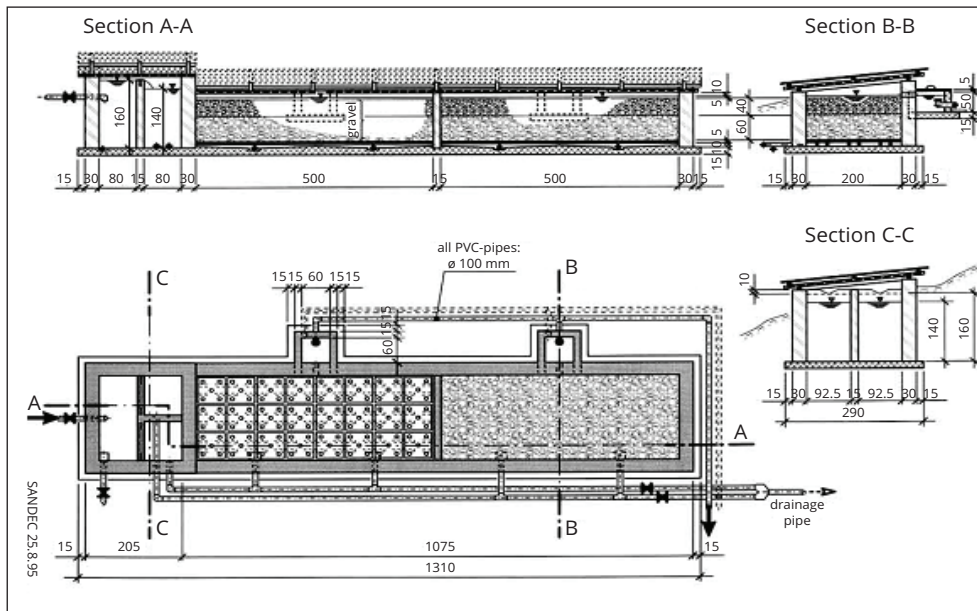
Layout of Upflow Vertical-Flow Roughing Filters
